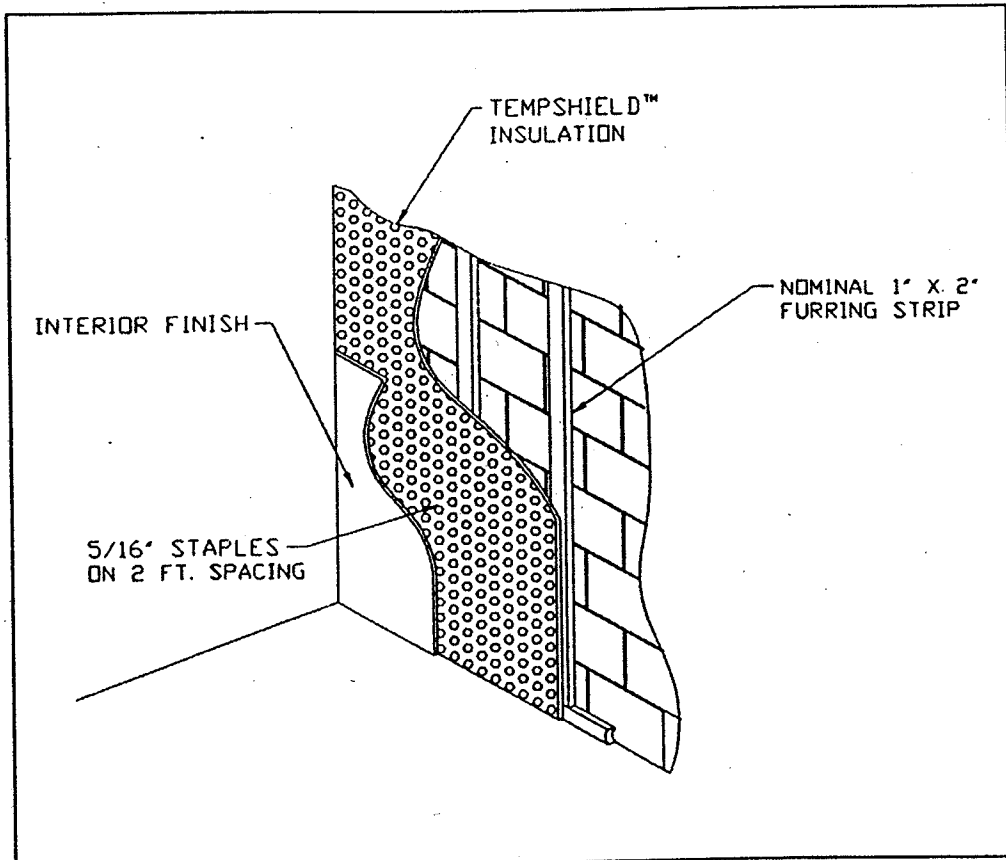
BLOCK WALL APPLICATION USING SINGLE FURRING STRIP
